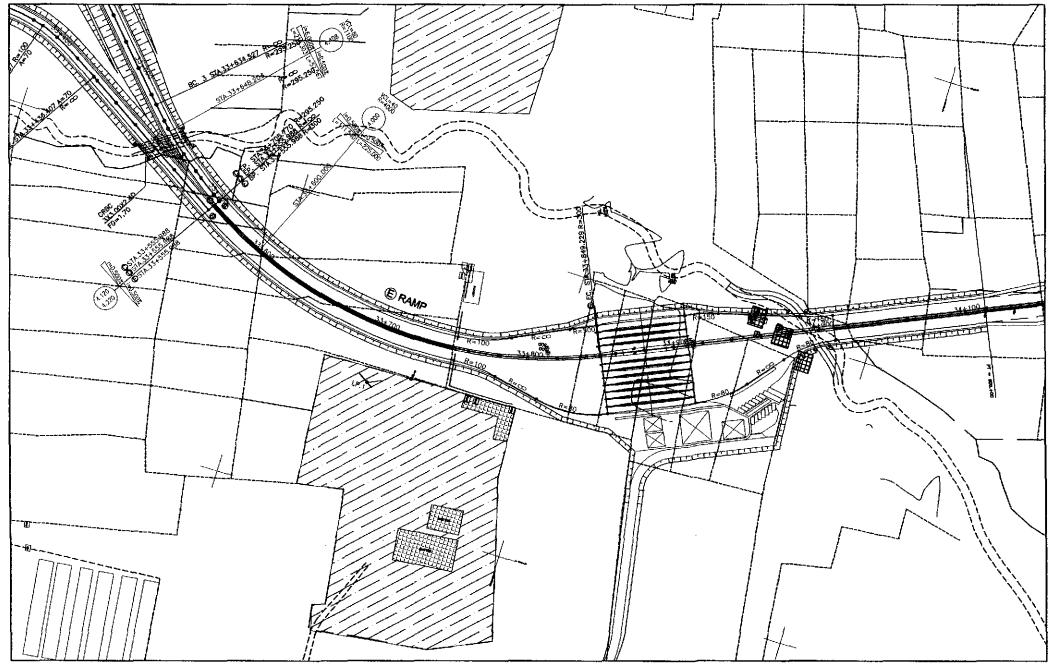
PLAN OF BUROL INTERCHANGE (4)
